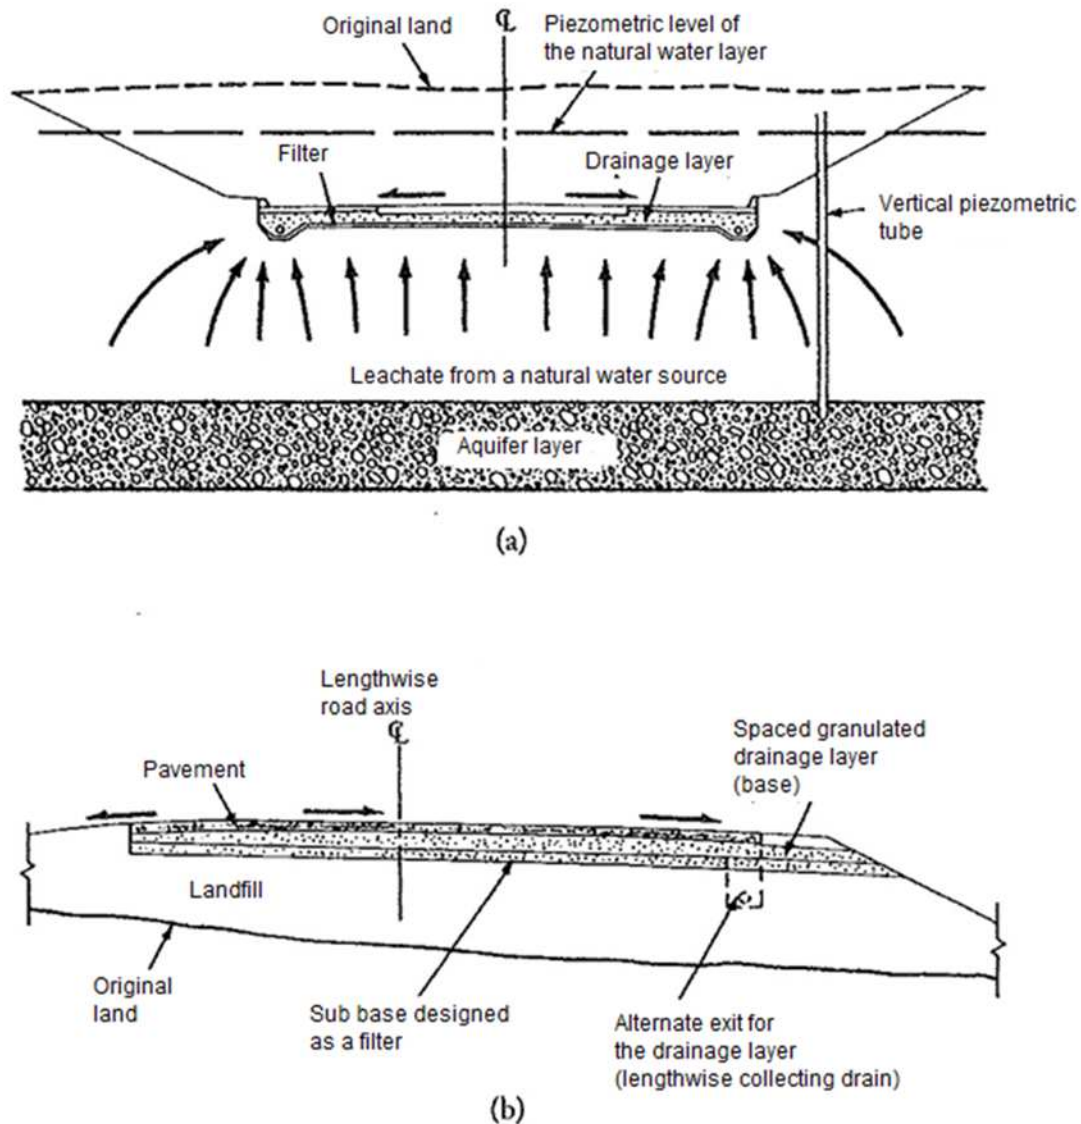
Applications of horizontal drainage layers. (Garber & Hoel, 2007)
